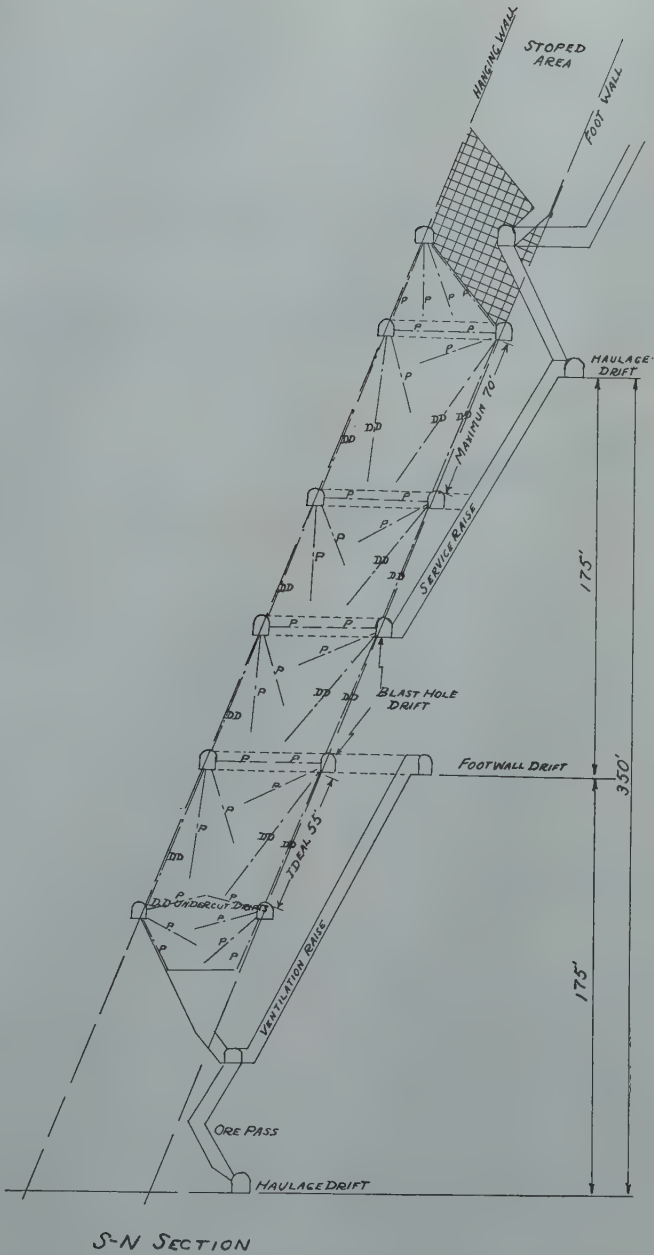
Ideal section showing ring layouts combining 2 in. percussion drill holes and AX diamond drill holes.
